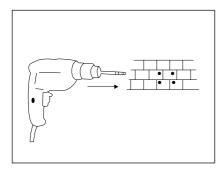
Use an electric drill to drill 4 explosive screw holes on the wall according to the hole positions on the fixture bracket.
